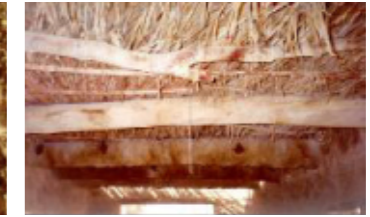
The roofs of the buildings are built from palm trunks which reduces heat gain inside the building
